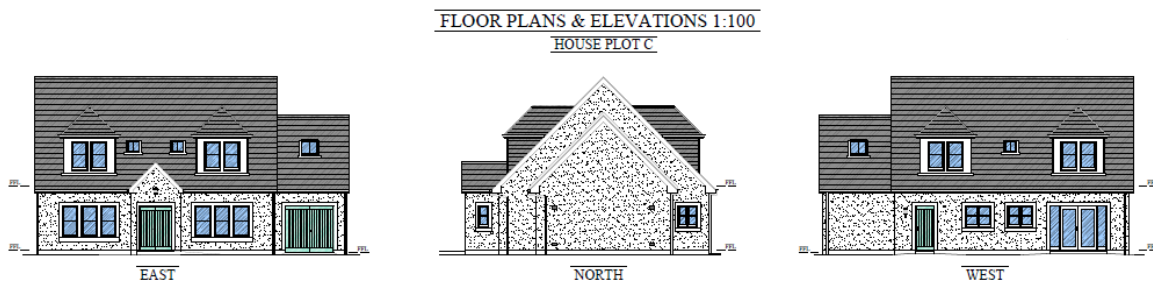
Proposed Elevations (Plot C) – Extract from Plan 03 (not to scale)
